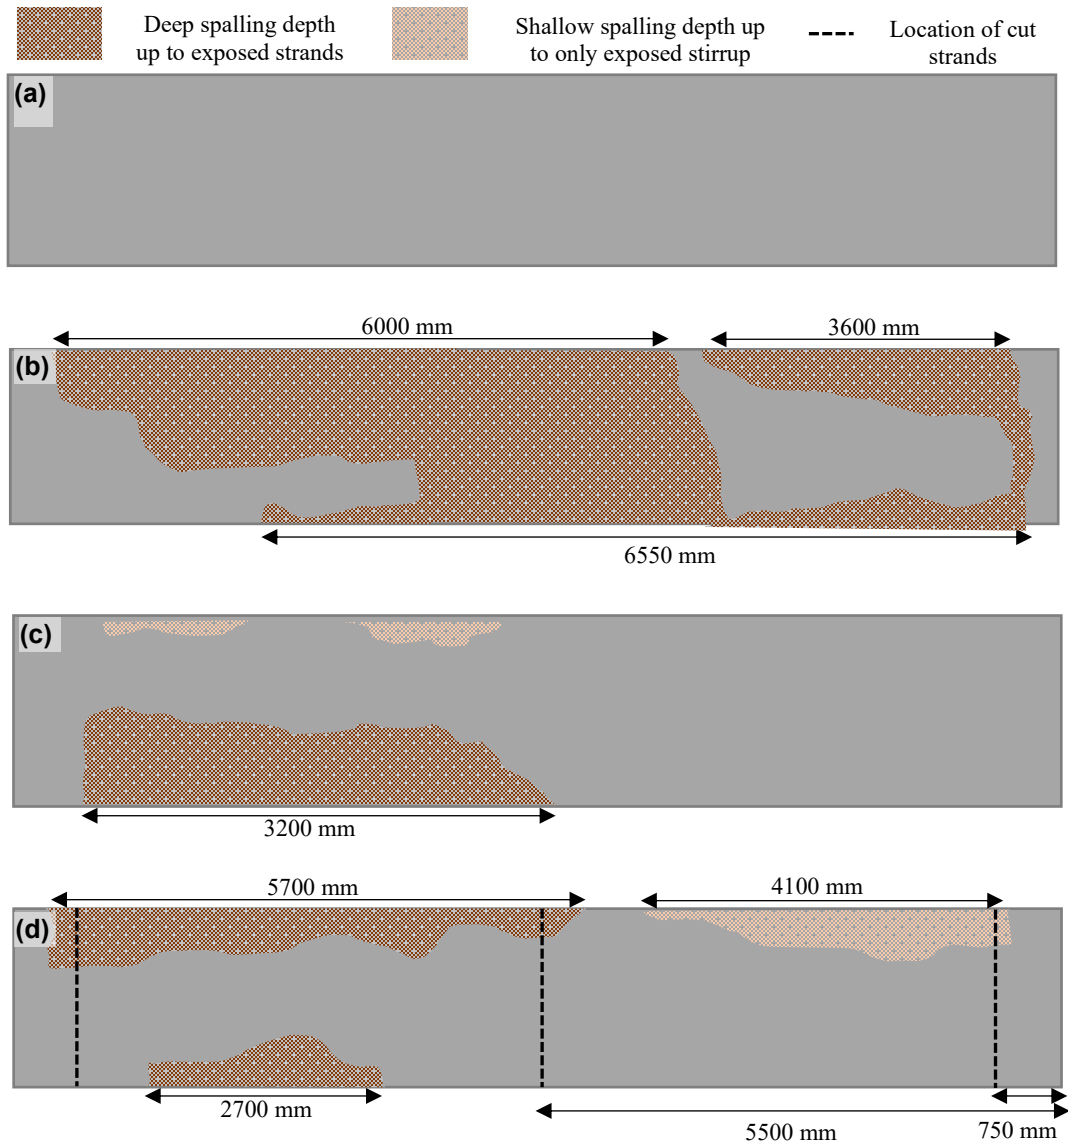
9: Deterioration mapping on the bottom of the specimens (a) Girder LD without any visible deterioration at 0% concrete spall (b) Girder HD had 70% overall concrete spall with both reinforcement and strand corrosion (c)Girder MD had 20% concrete loss with rebar corrosion and light strand corrosion (d) Girder LD had 20 % concrete loss with rebar corrosion and light strand corrosion.
